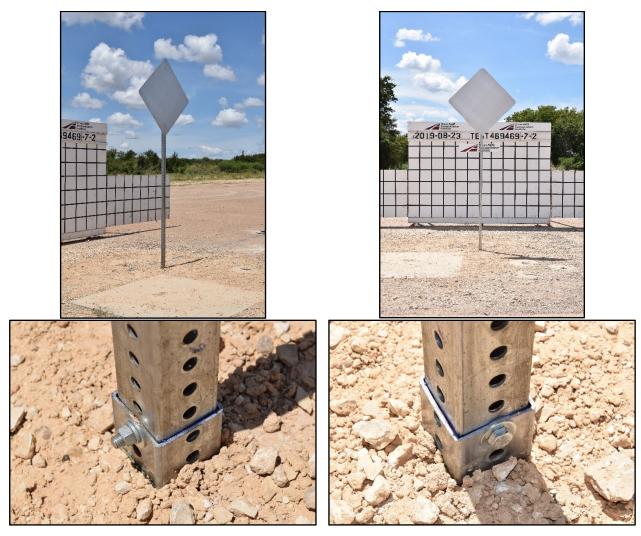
PSST Sign Support in Anchor Stub System prior to Test No. 469469-07-02.
